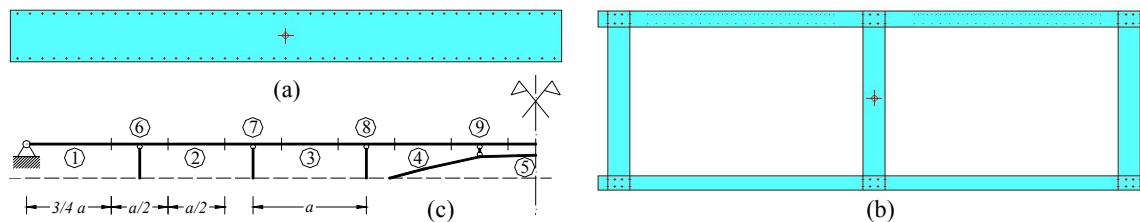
DETAILS OF THE CROSS-SECTIONS AND REINFORCEMENT LAYOUT: (A) ARCH; (B) BEAM; (C) BEAM SUBDIVISION (SEE TABLE 1).
